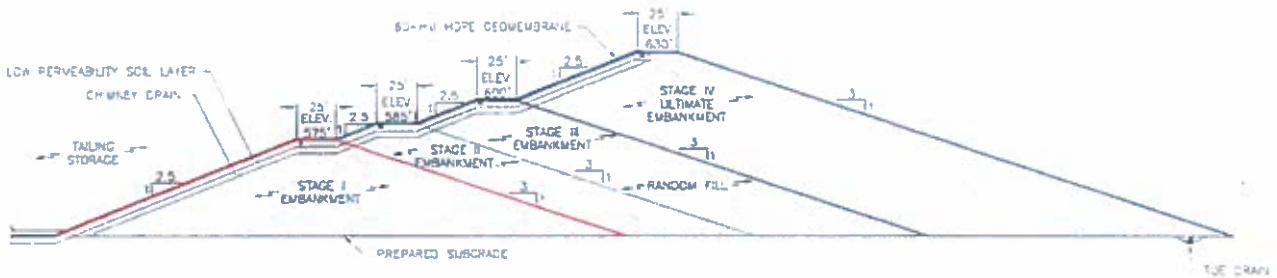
Cross Section of the Tailings Storage Facility Embankment Showing the Stage of Construction
